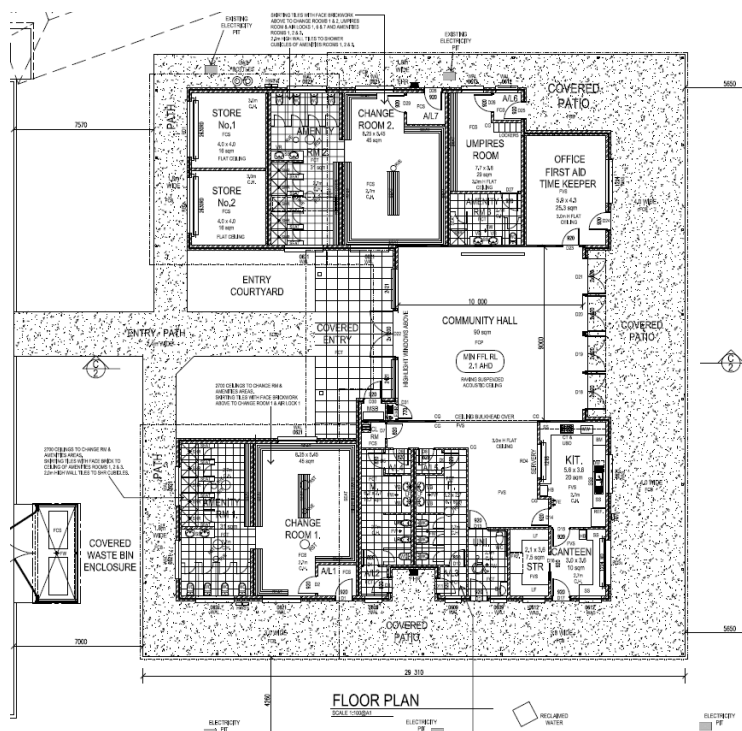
Indicative Combined Sporting Amenities and Community Facility Floor Plan
